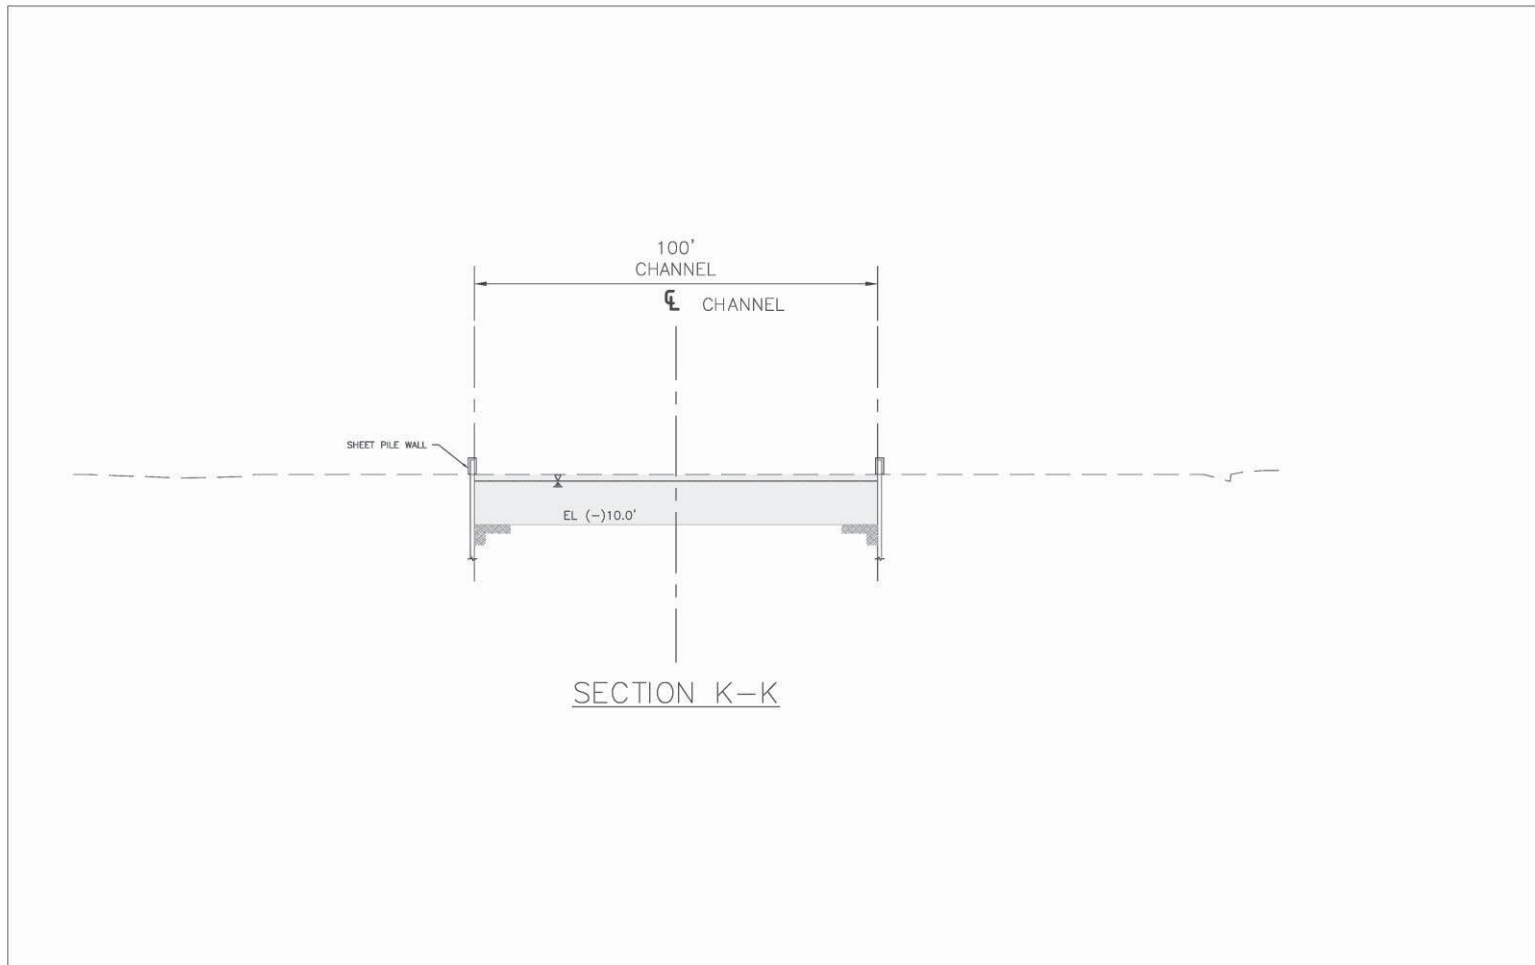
Cross Section K-K, Typical Channel Below Dr. Barbosa Avenue Bridge
